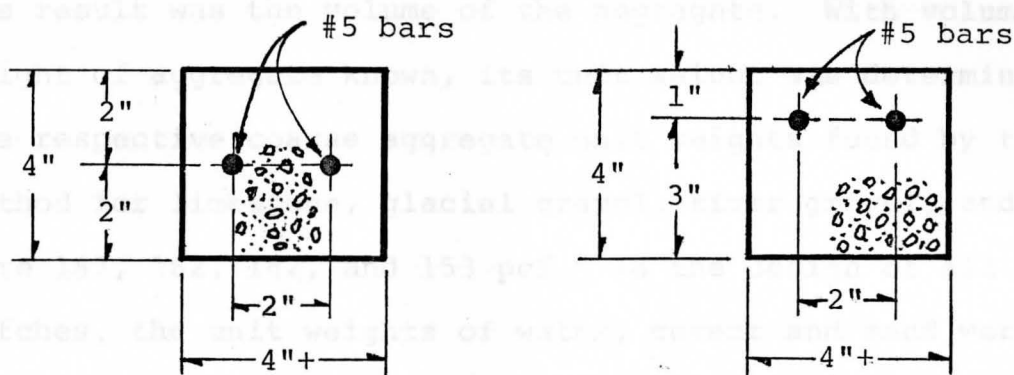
Beam Cross-section Showing Position of Reinforcing Steel.
